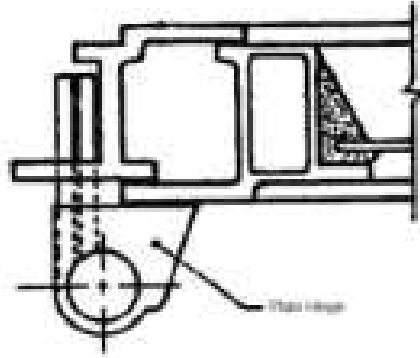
Typical Non Projecting Type Hinge for Door
